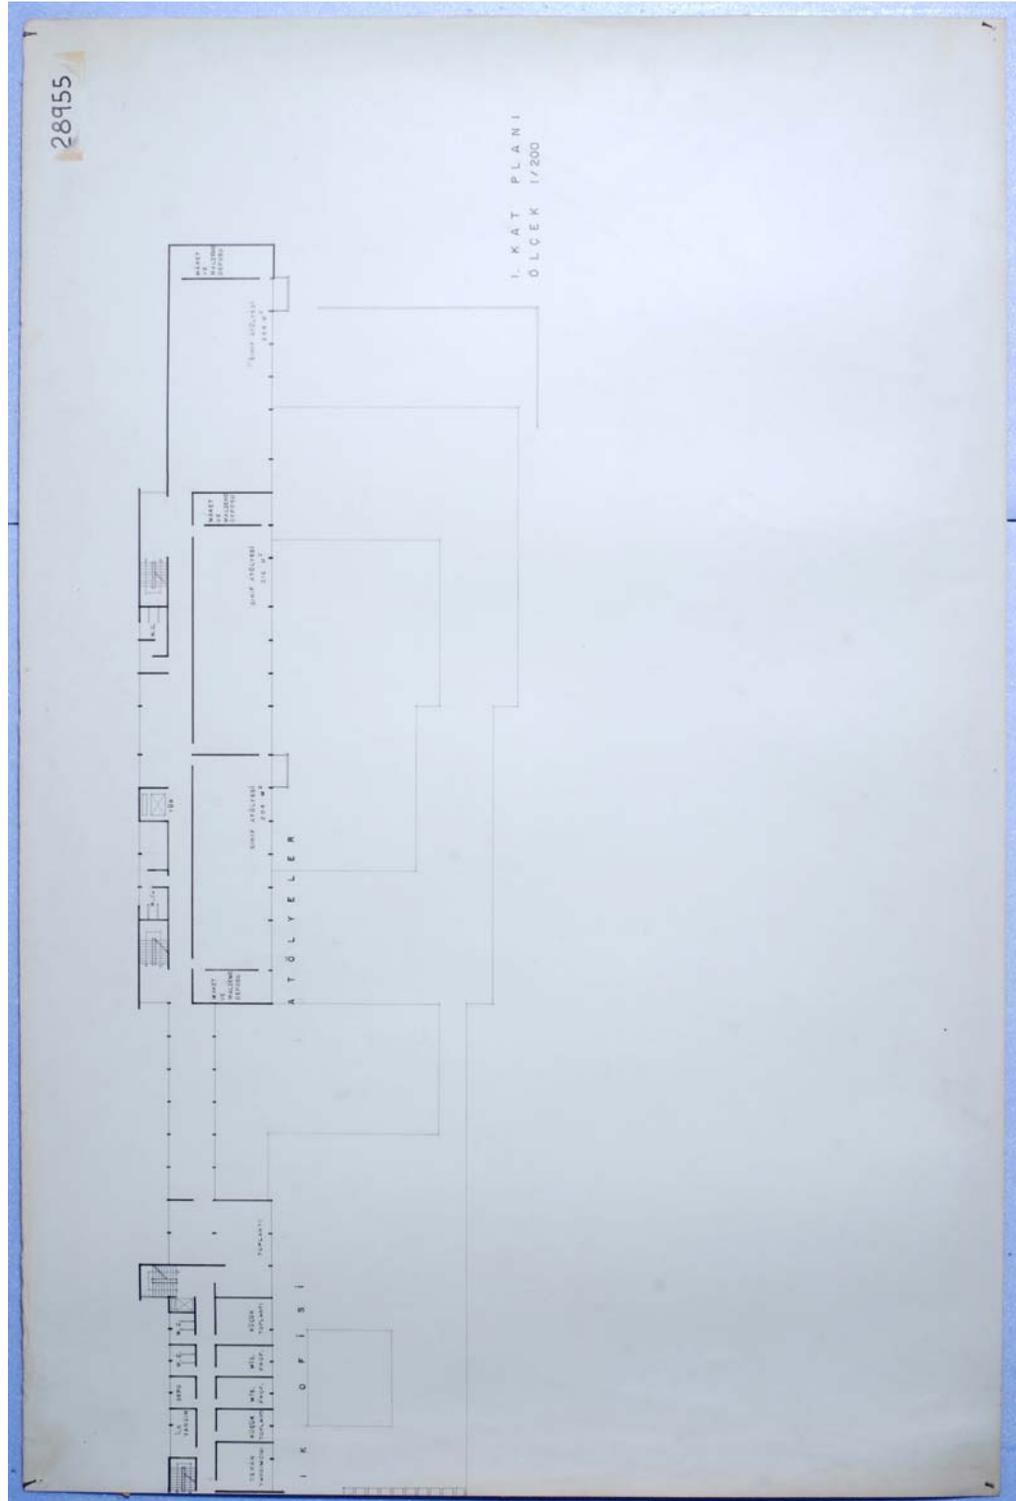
First Floor Plan, part. 2; School of Architecture building; Second Place Winner (project no. 18), Second Competition, Esat Turak, Gürol Gürkan, Önder Sonad, Aktan Yörükoğlu, Osman Armangil (Source: Çinici office archives).
